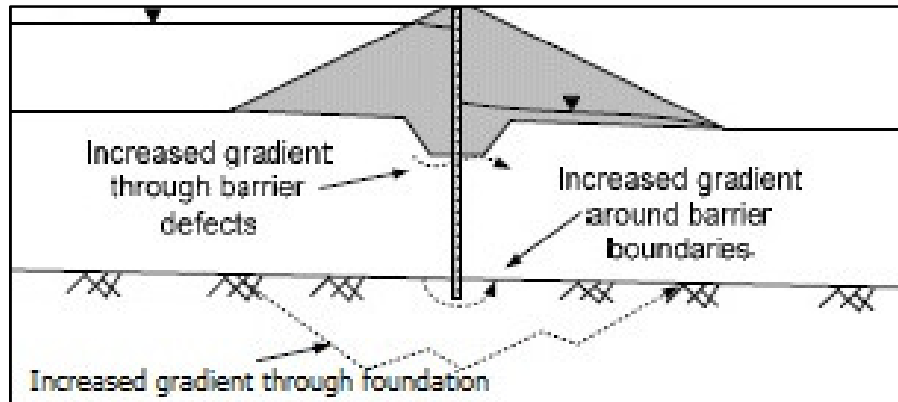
Underseepage with Cutoff Wall (Adapted from Rice et al. 2010)
